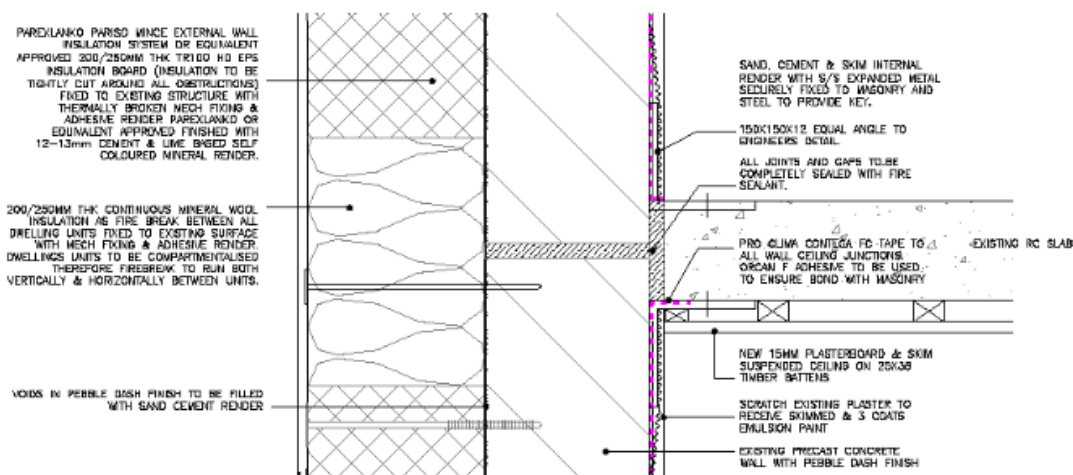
Wall floor slab junction(not to scale)[DRL.Co.Co2014].
